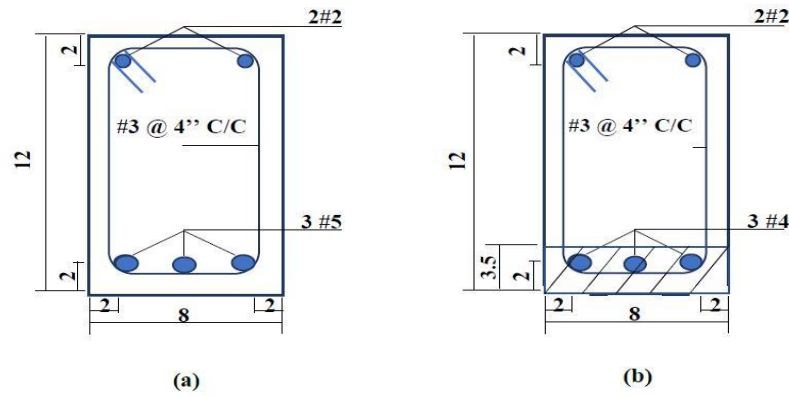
(a) Undamaged control beam and (b) damaged beam to be repaired with FR-SCC (all dimensions are in inches) (Abdulhameed, 2018)
